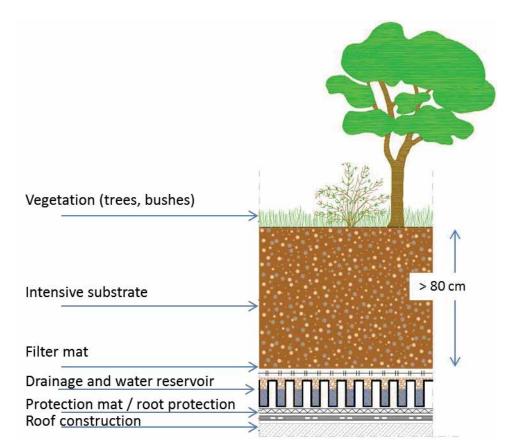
Schematic build-up of a green roof (above the roof construction); translated from climagruen.de
